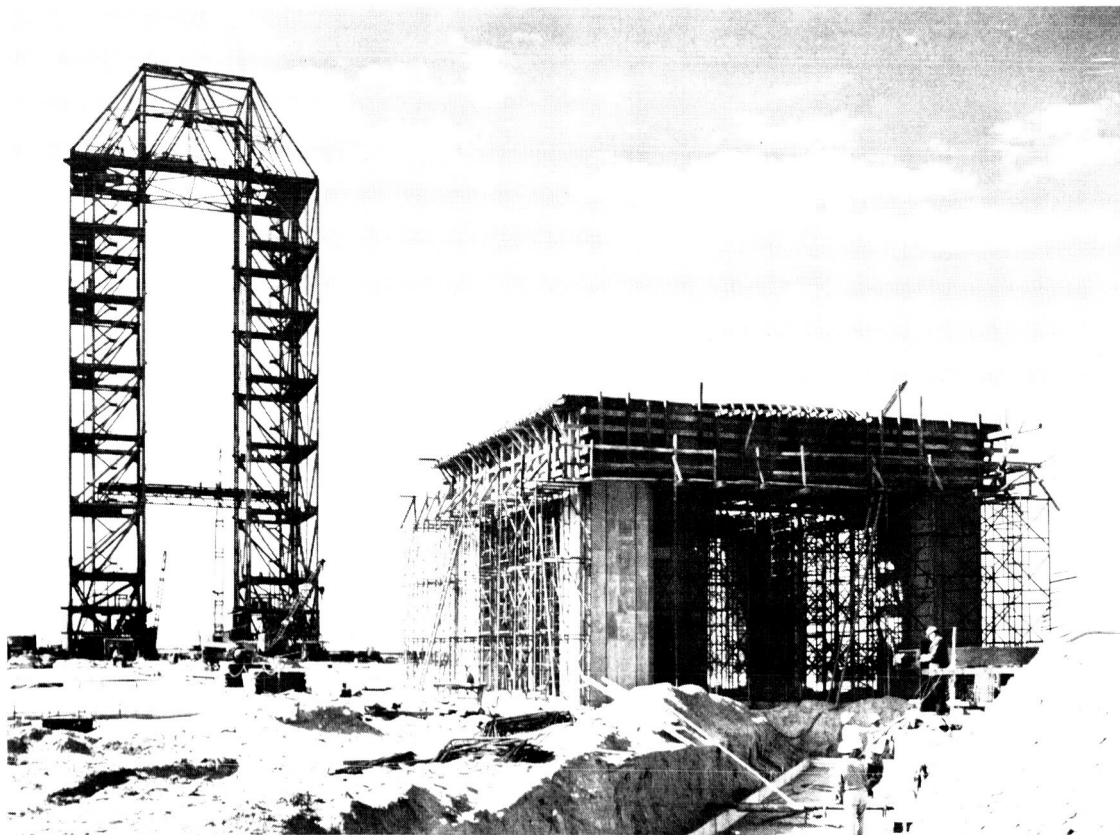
CONSTRUCTION OF SERVICE TOWER AND PEDESTAL
